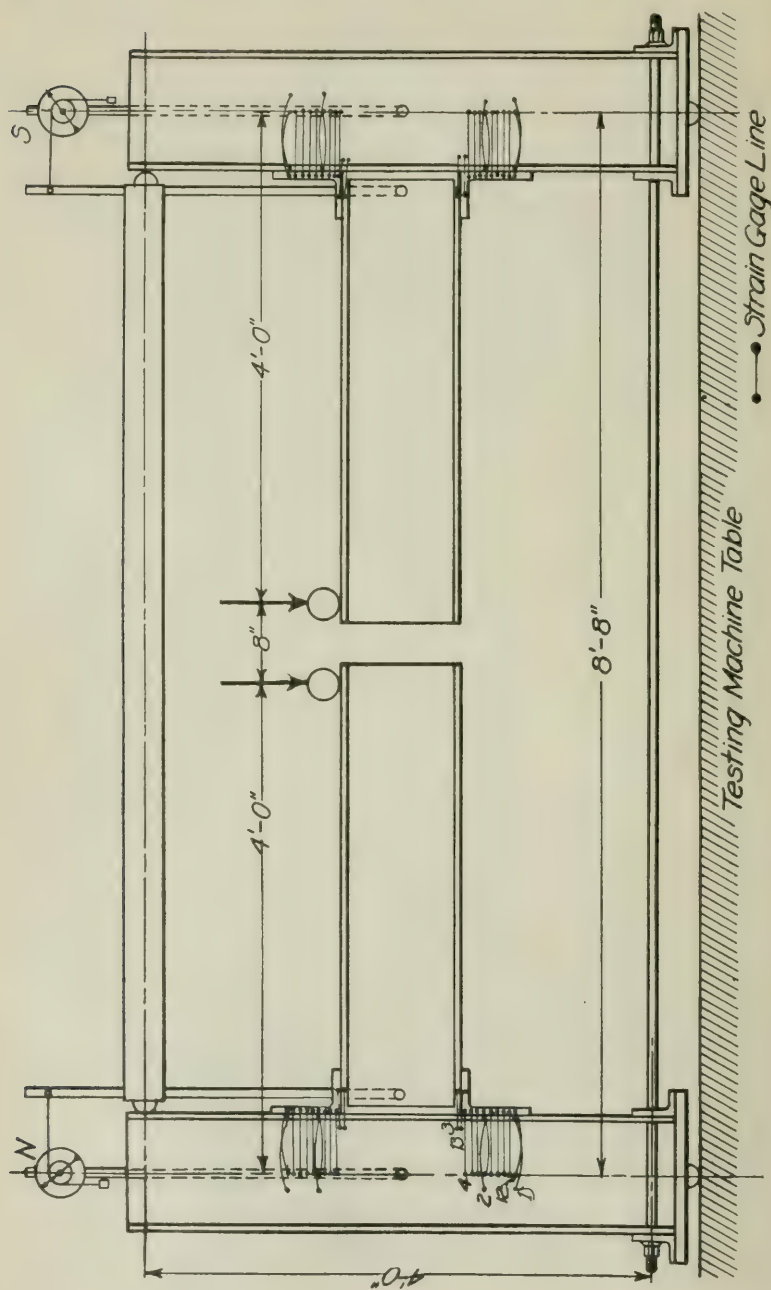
MEASUREMENTS OF ROTATION FOR TEST PIECES A3
